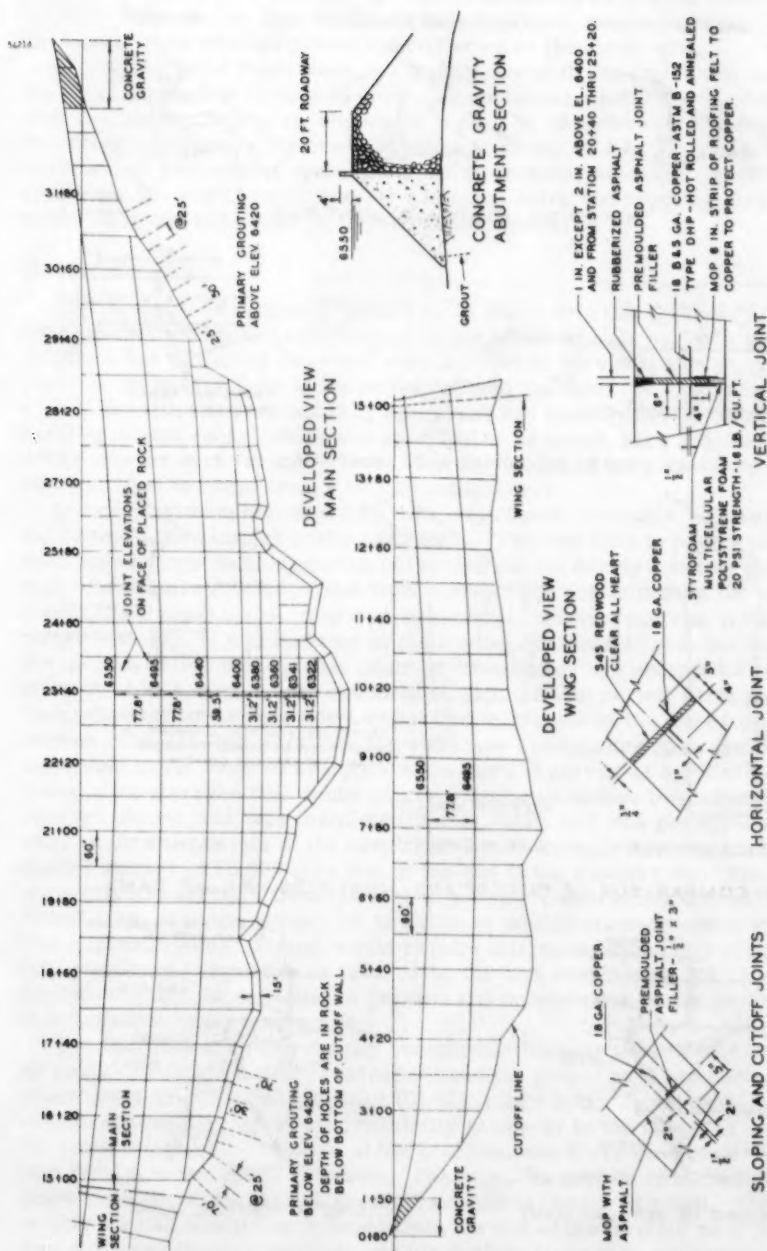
JOINT ARRANGEMENT AND DETAILS - GROUTING PATTERN - ABUTMENT GRAVITY SECTION - WISHON DAM
